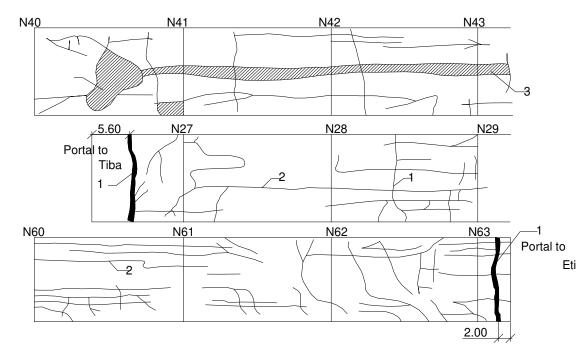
Namuya tunnel - Kanto earthquake cracks and crashes: 1-cross-section cracks, 2-longitudinal cracks, 3-vault collapses.
